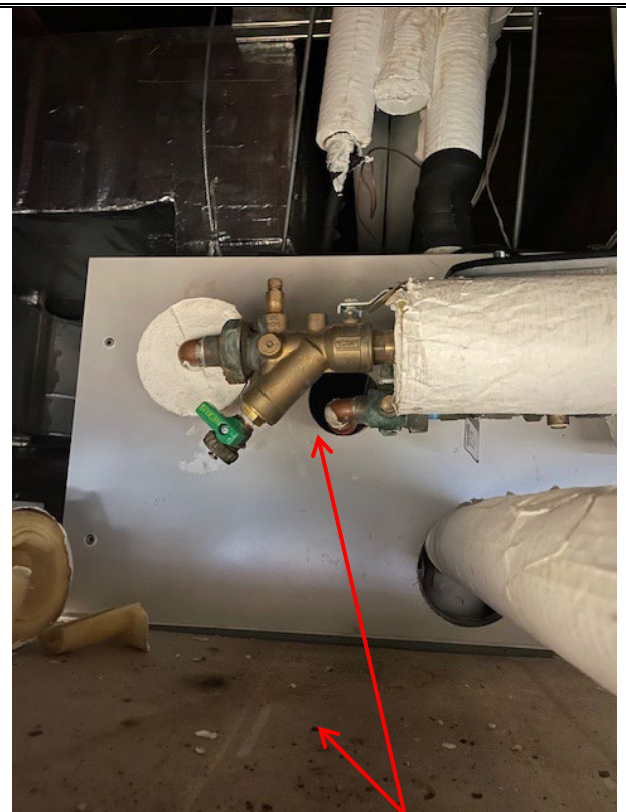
Classroom B032 - View in ceiling plenum at AHU showing uninsulated HVAC piping allowing for condensation dripping onto ceiling tile below.
